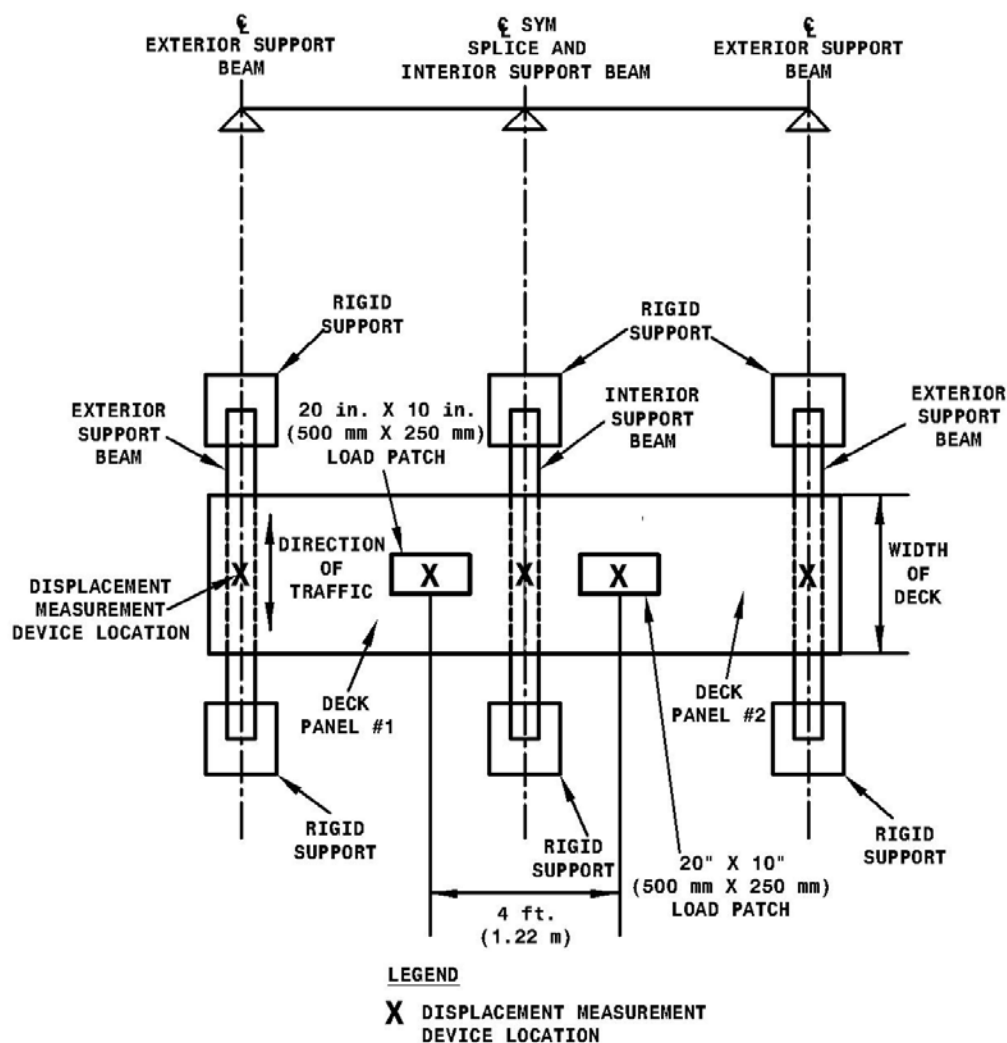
Minimum Instrumentation Required for Longitudinal Splice Test
